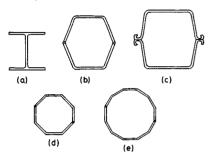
Steel-bearing piles of various types. (a) Universal bearing pile (UBP); (b) Rendhex foundation column (obsolete); (c) Larssen box pile; (d) Frodingham octagonal pile; (e) Frodingham duodecagonal pile
